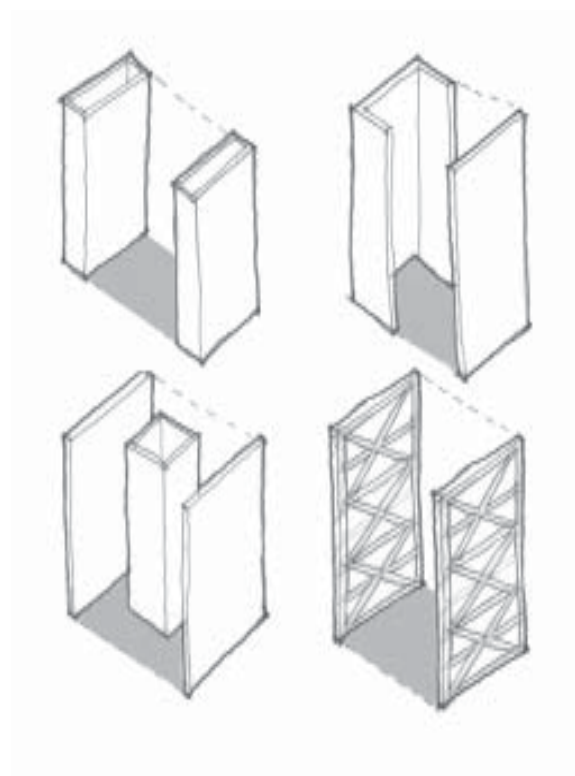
Shear walls are used in many different applications, including stairwells, party walls, elevator shafts and exterior skins.
